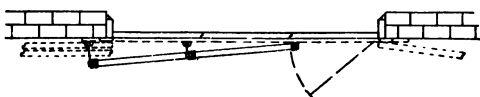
FLOOR PLAN, THREE DOOR OUTFIT
